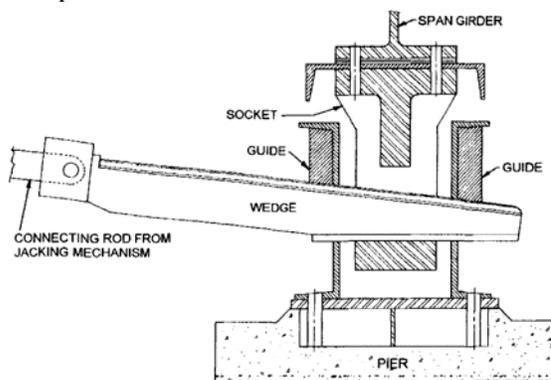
A wedge shaped lock used to hold a vertical-lift span rigidly in place
